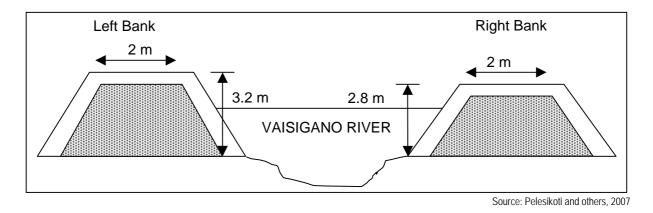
Cross-section of proposed floodwall for 1-in-100 year event.
